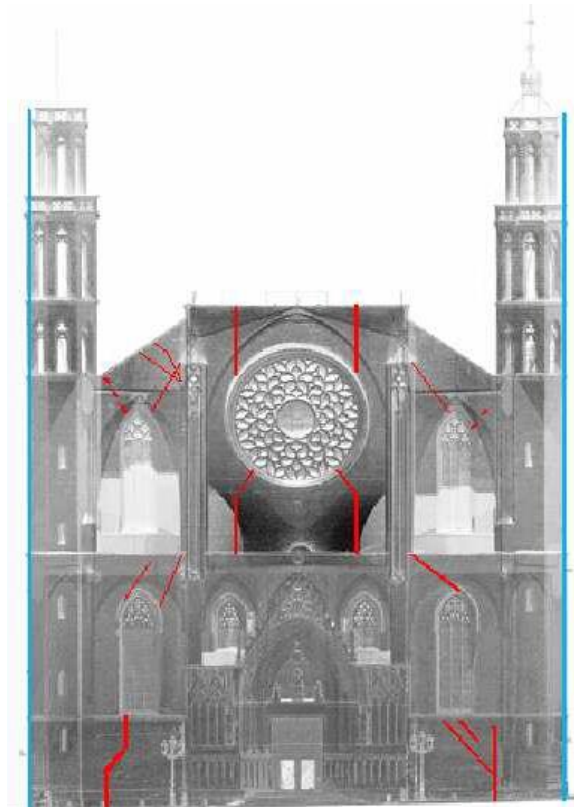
Vertical crack below windows (left) and inclined crack from windows towards tower.
